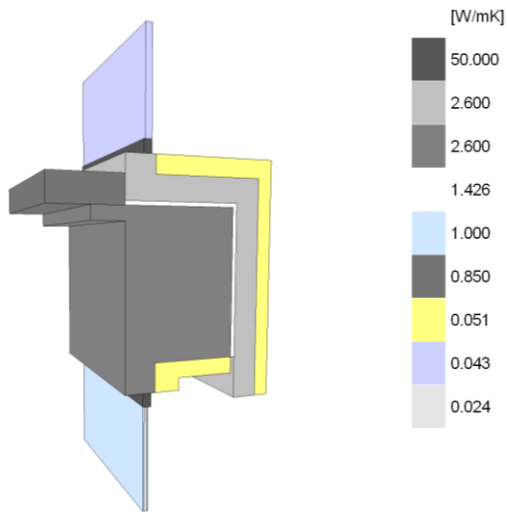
Input model with additional insulation on the outside of the prefabricated concrete element
